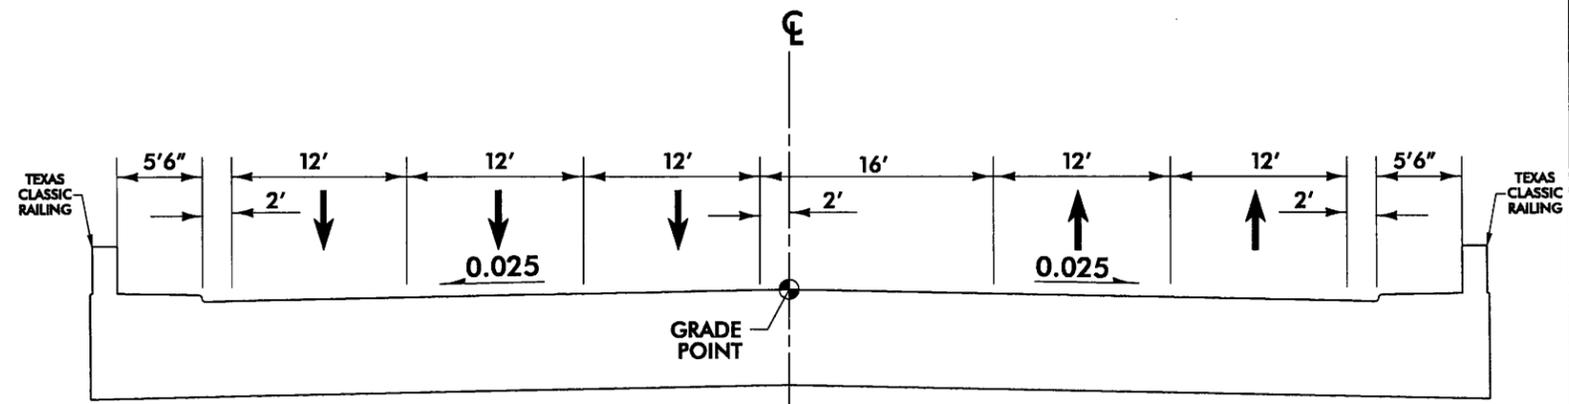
DETAIL FOR STAGE 2 CONSTRUCTION OF BRIDGE
